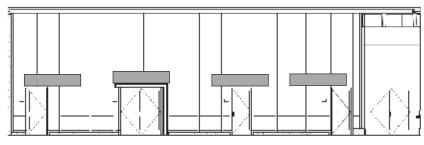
TYPICAL CONCEPT ELEVATION - RETAIL WALL SIGN
